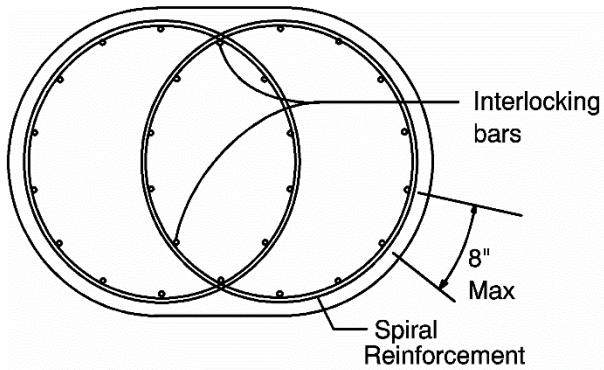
Column Interlocking Spiral Details
